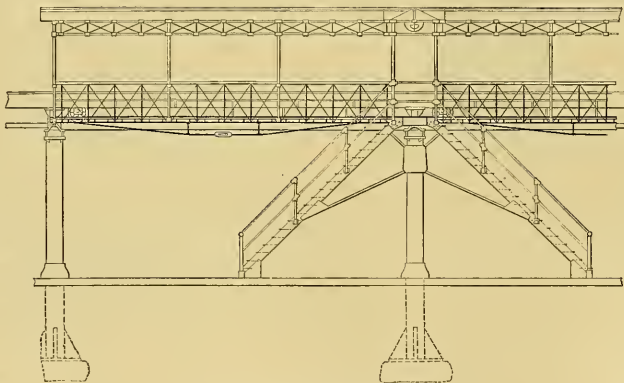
ADAMS' ELEVATED RAILWAY.
